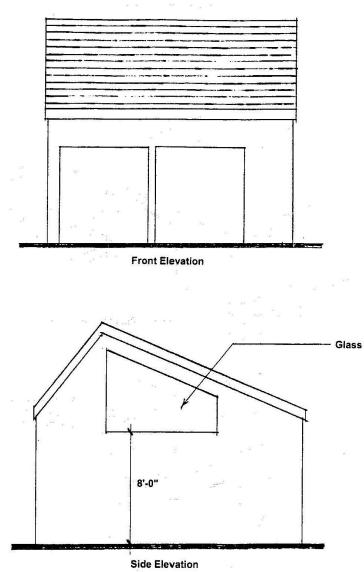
Garage Elevation Uneven Gable Roof
